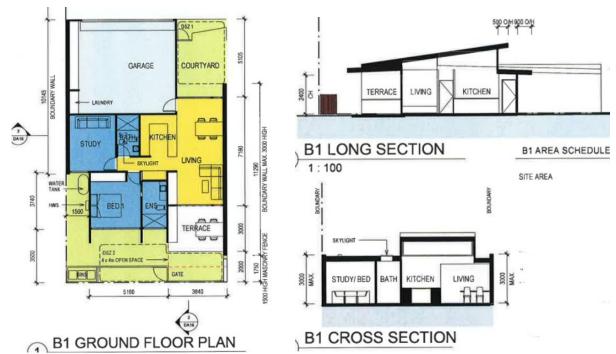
Dwelling Type B1 as approved on subject site under DA13/0401
